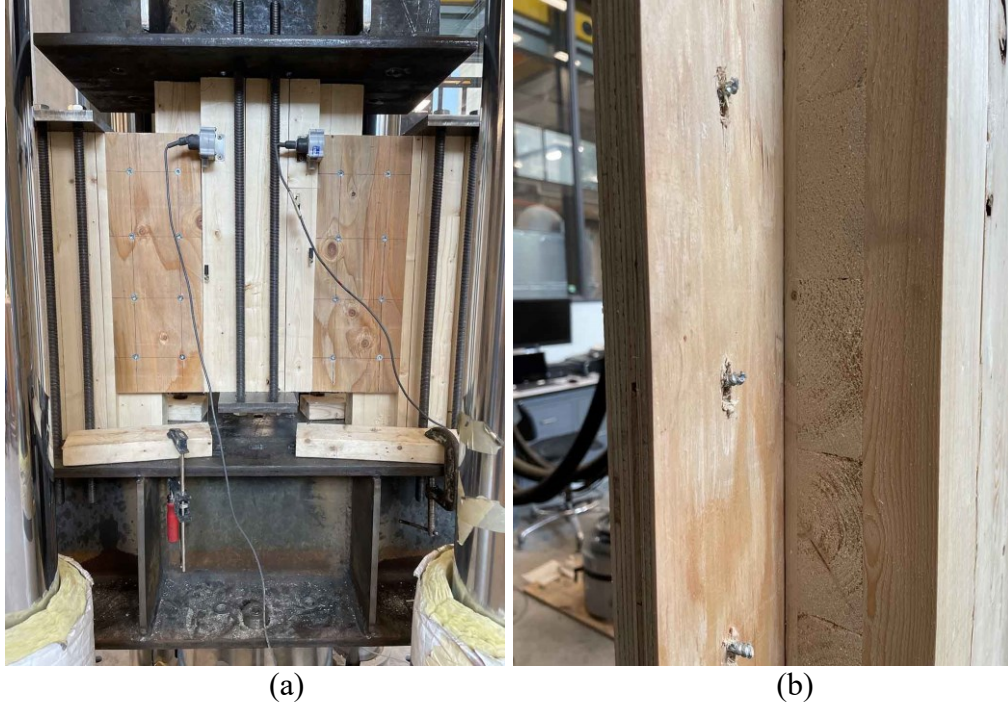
HBS 6×70 mm panel-to-panel connections under shear: (a) prior to the test (b) after the test
